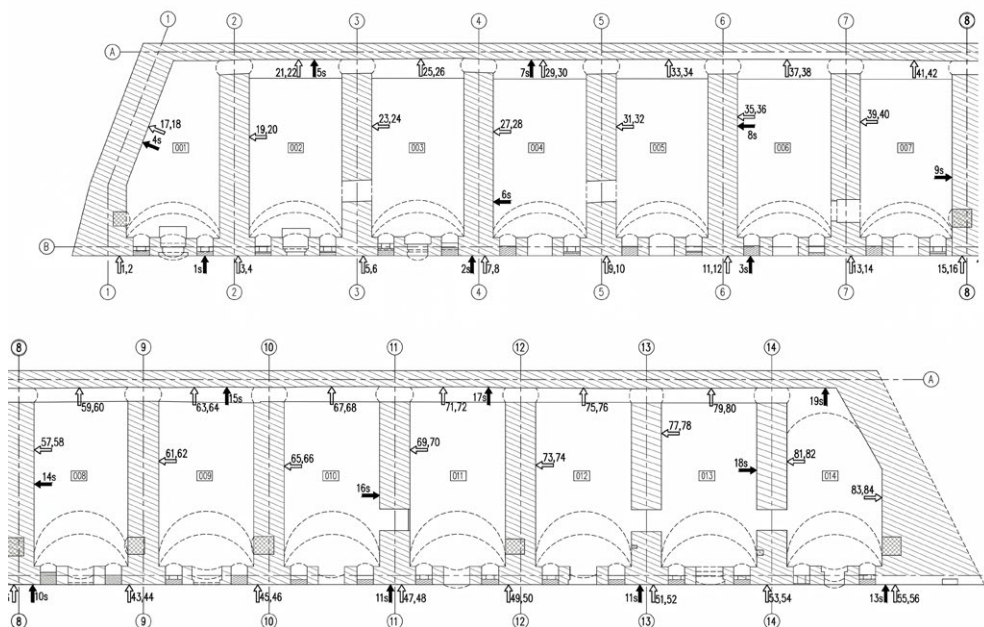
Ground plan of the White Barracks with marked sampling locations, white arrows – moisture testing, black arrows – salinity testing [Archives of the Department of Conservation of Monuments]
